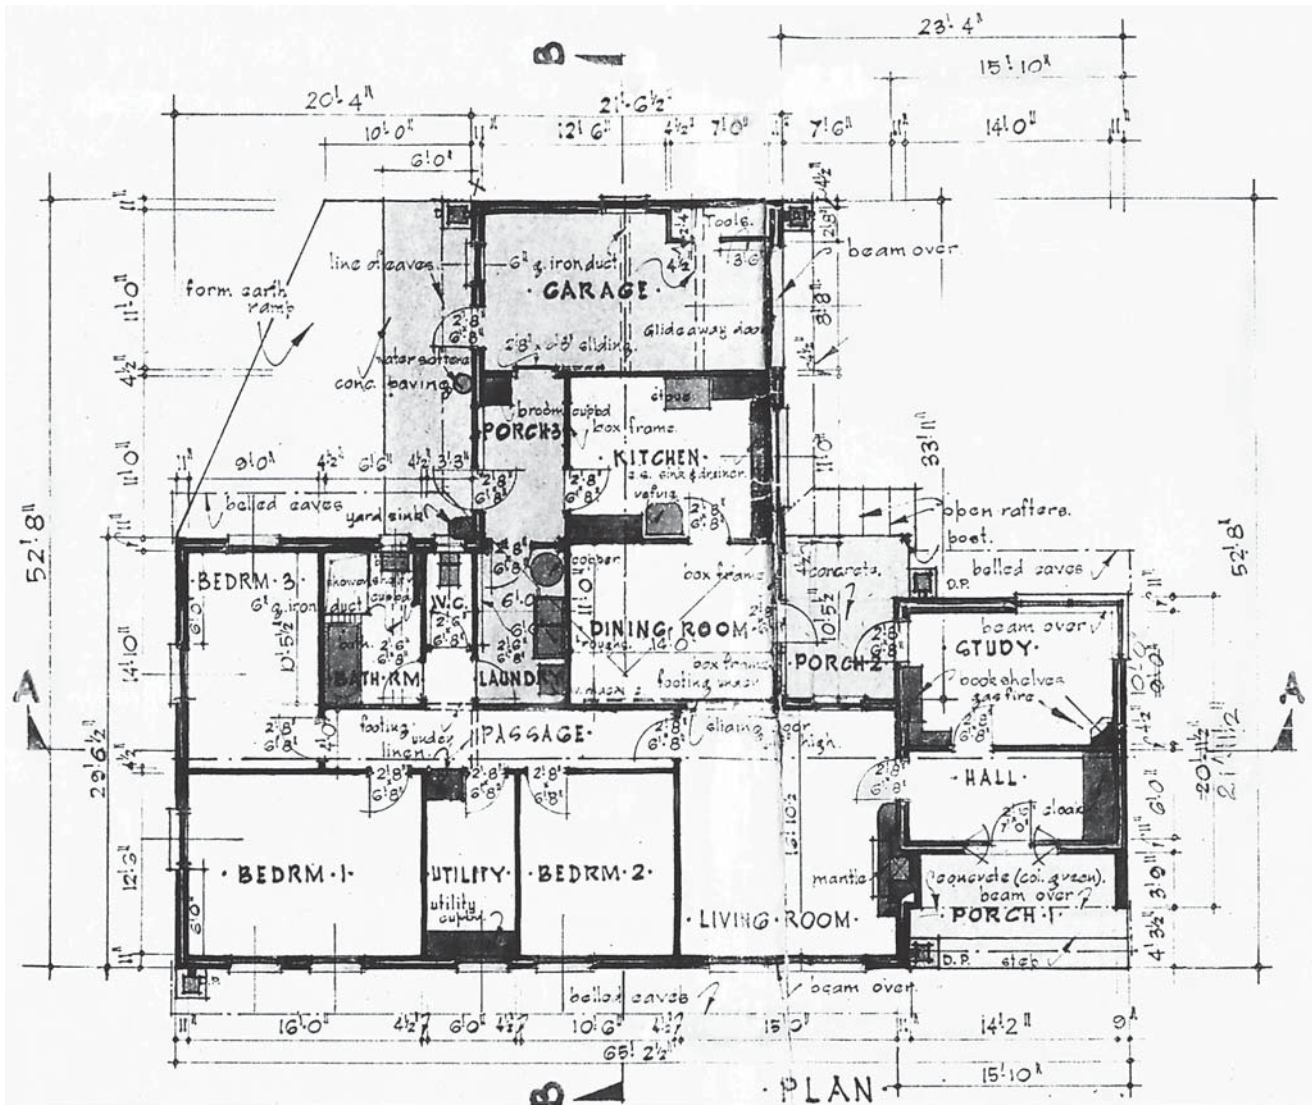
Architect's plan for the new rectory to be built in the SE corner of the Church Acre. (Dean W. Berry, Gilbert, Barker & Polomka, dated 1958)
